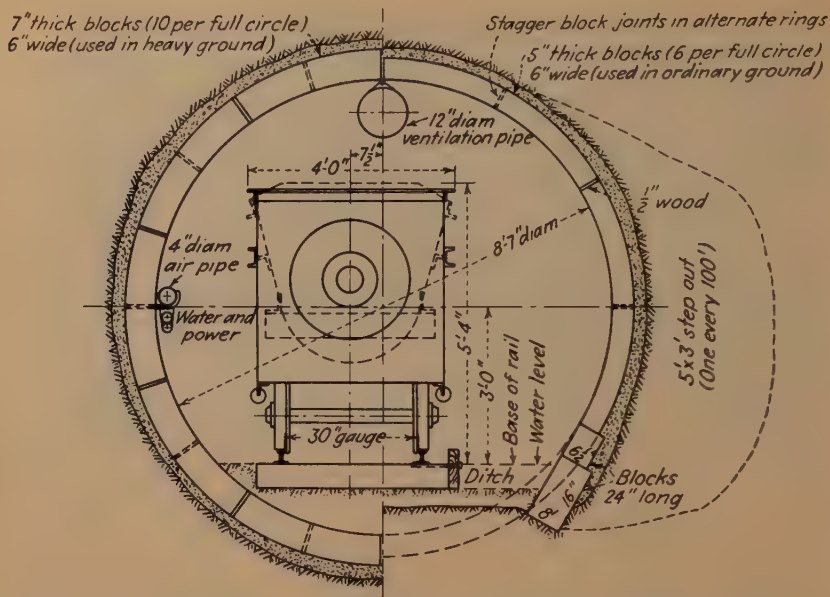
CROSS-SECTION AND PROJECTION OF CONCRETE-BLOCK-LINED GALLERY.
